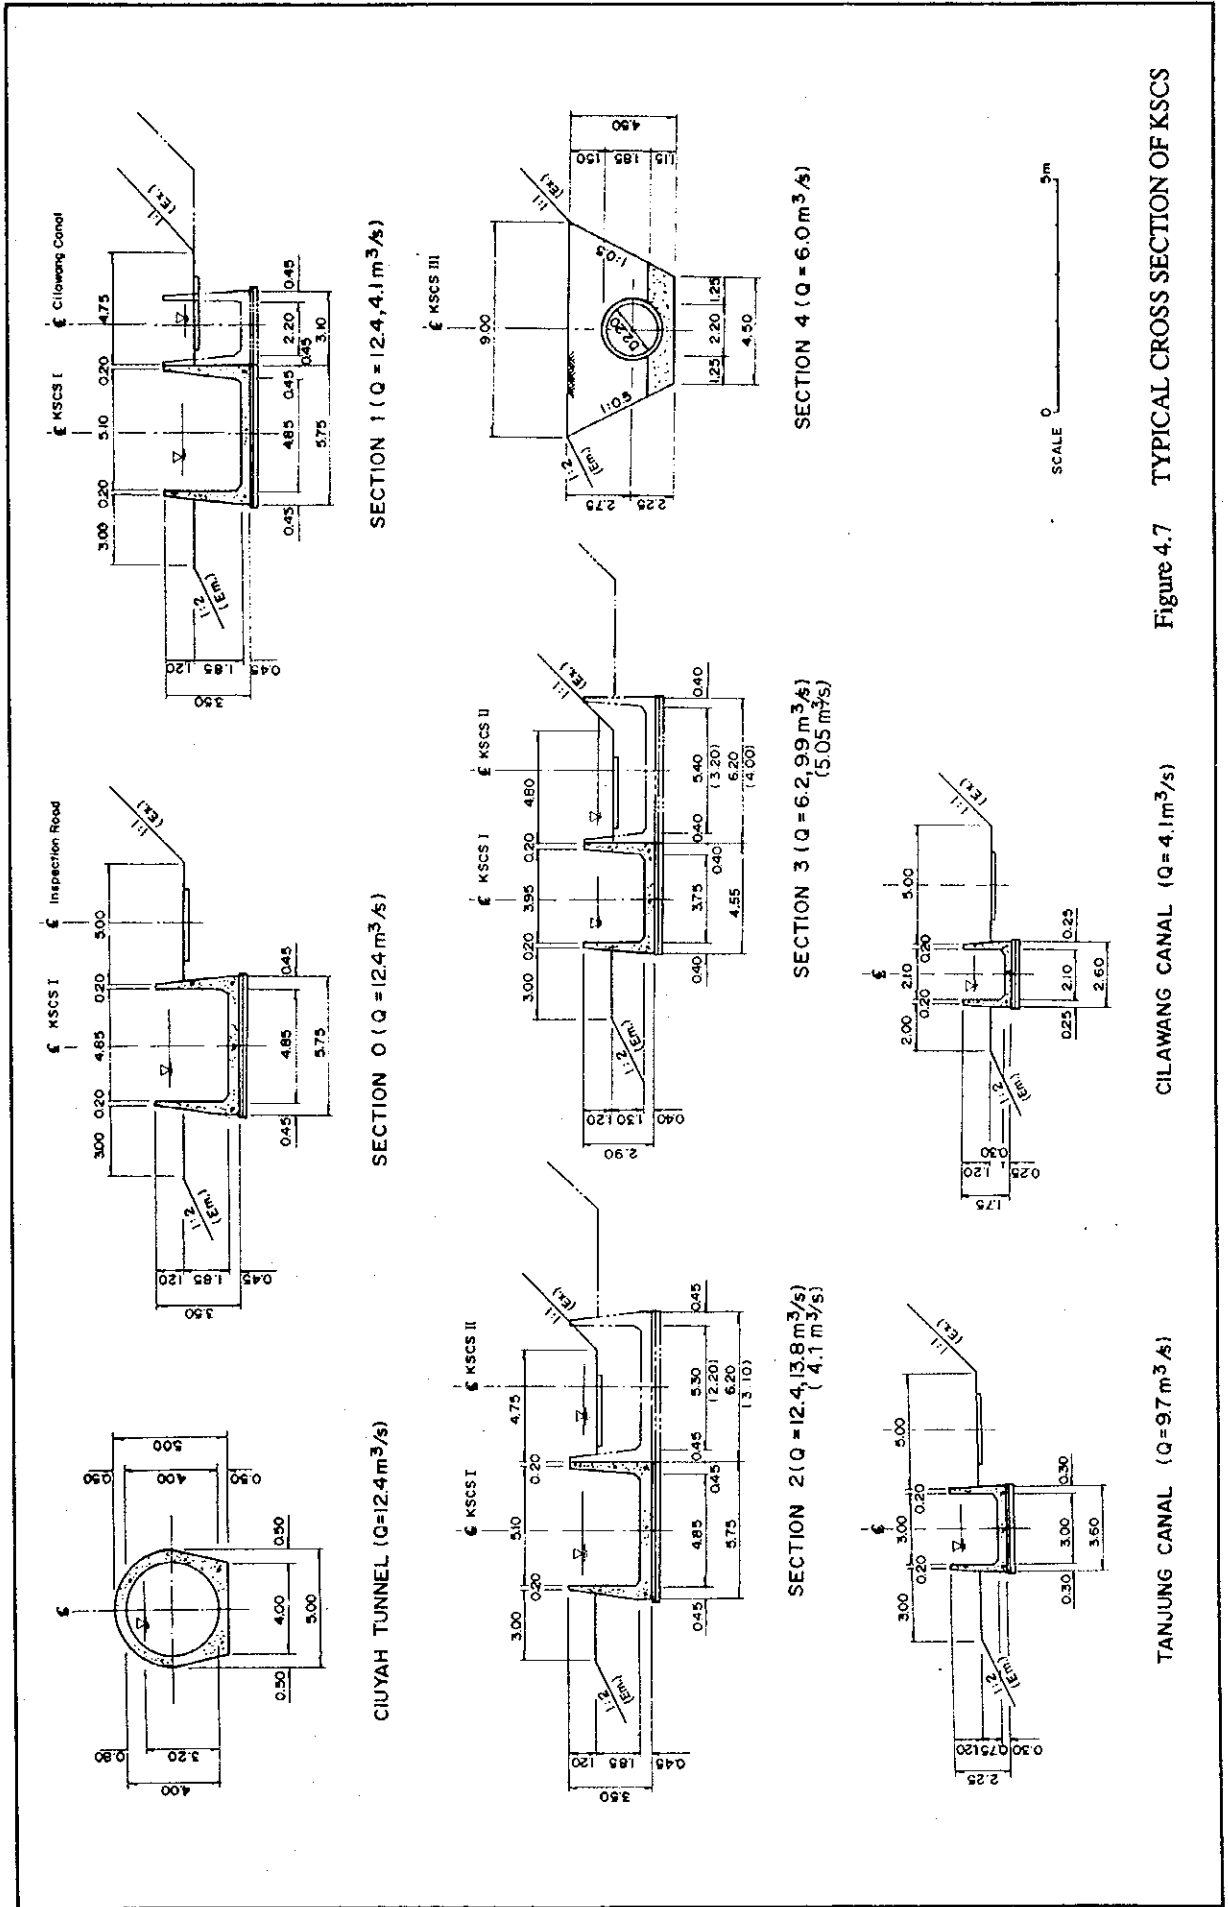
TYPICAL CROSS SECTION OF KSCS
